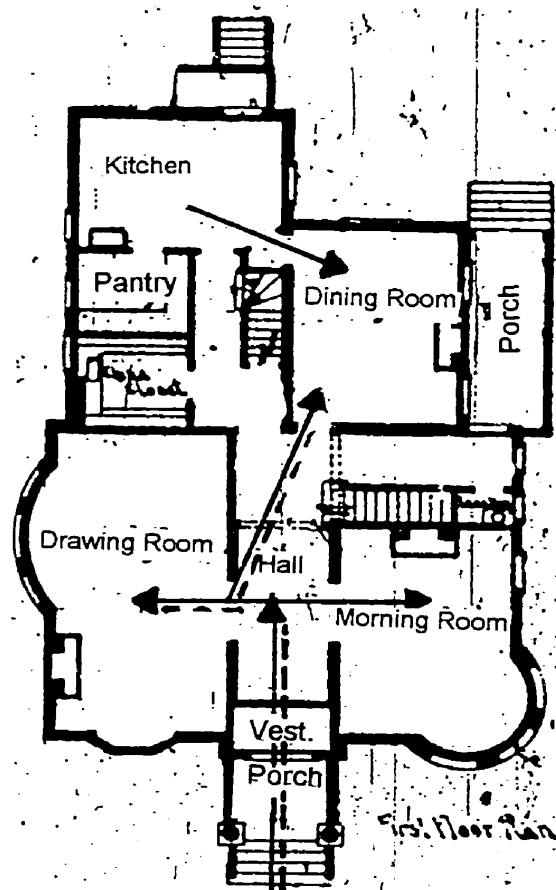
MacNab Street Houses. Ground Floor. Architectural Plans
